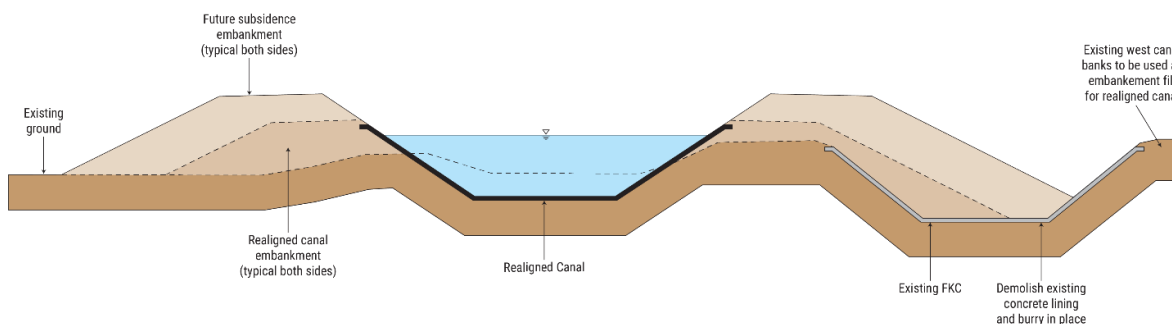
Trapezoidal Cross Section in the Parallel Canal Alternative
